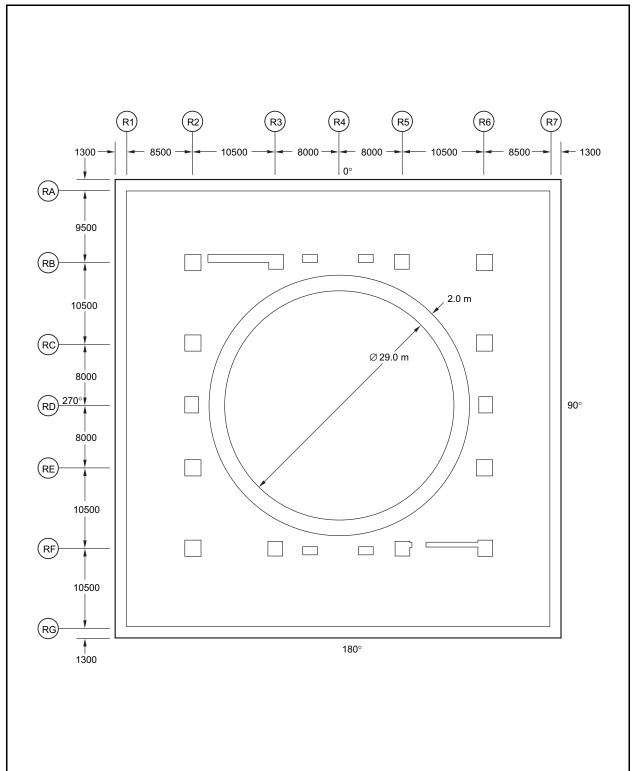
Reactor Building Arrangement Floor B2F Elevation –1700 mm
